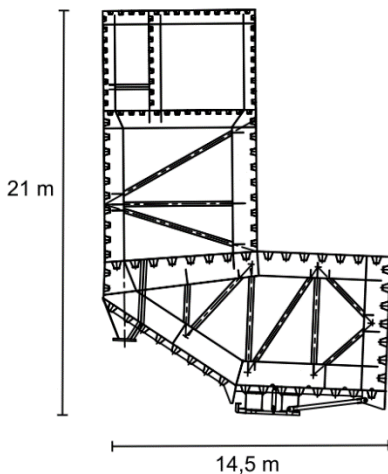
A cross section of the Maeslant barrier's retaining walls (source: Rijkswaterstaat)
